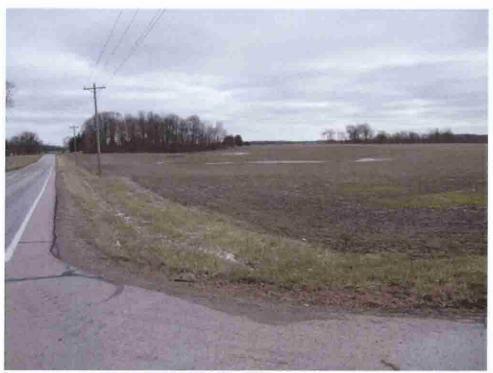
Supplement to Figure 12: Intersection S.R.36 & Bullard Rutan Rd. (Facing Northeast)
